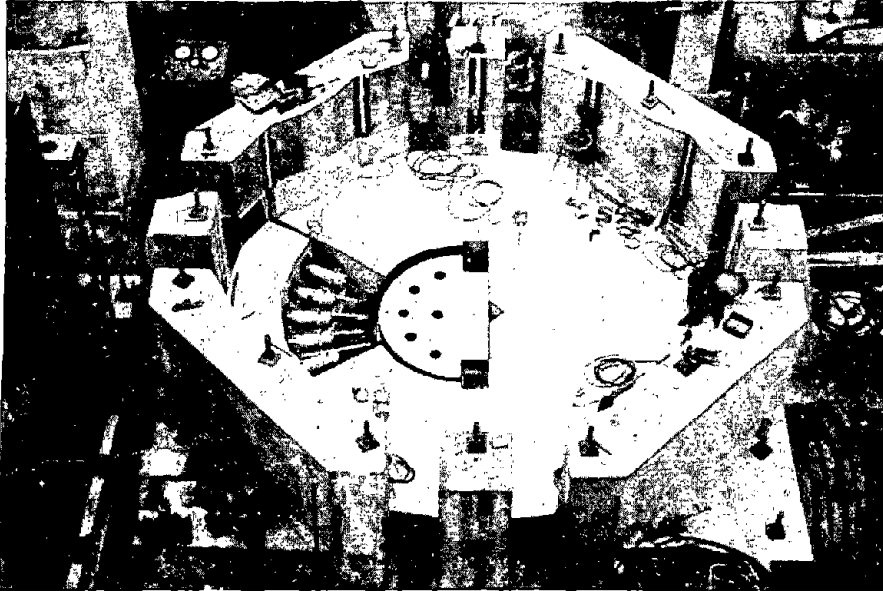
TEST FACILITY WITH FORM IN PLACE FOR CASTING ARCH SPECIMEN
